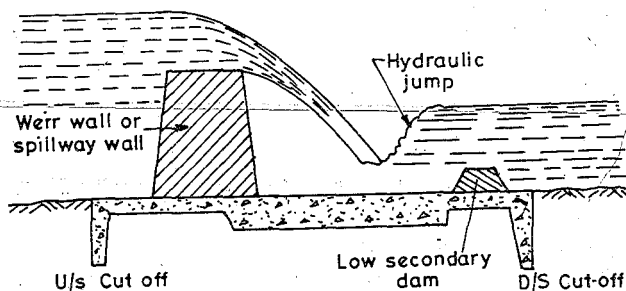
(b) Straight drop spillway with d/s protection works.
